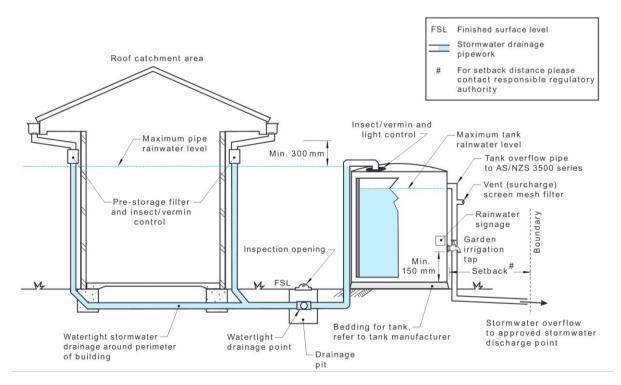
Charged (wet) above ground installation (source: Australian Standards 2008)
